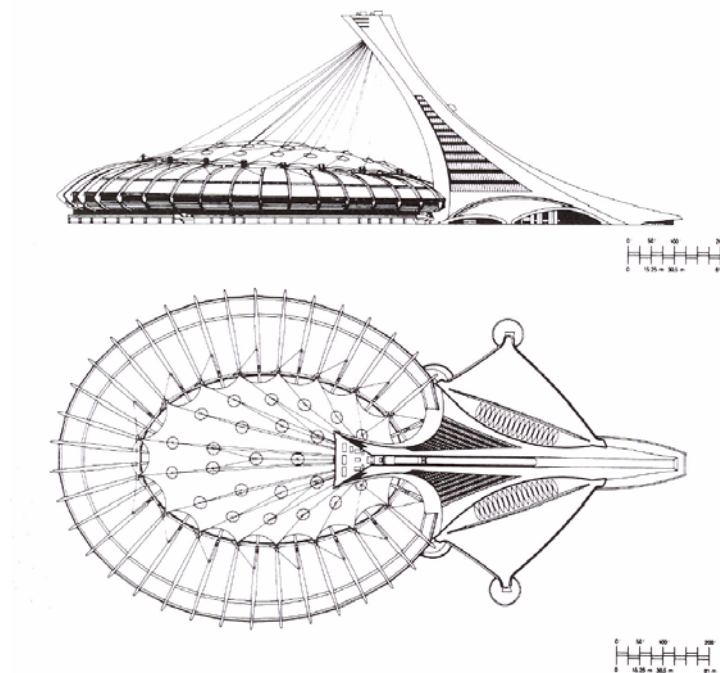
Montreal Olympic Stadium retractable fabric roof [38]
